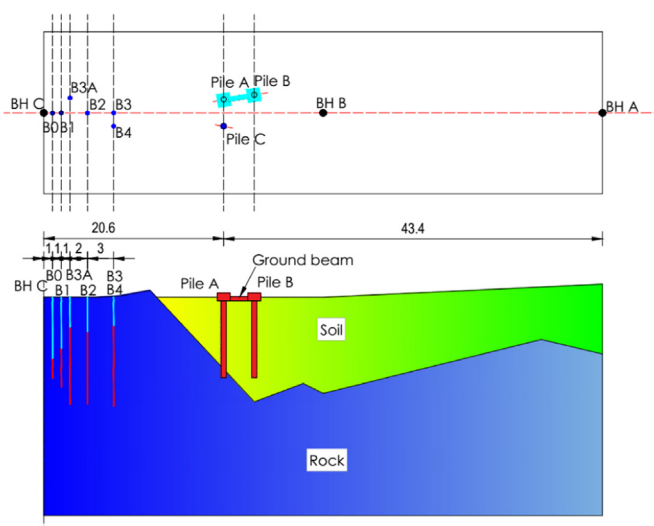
Plan and section view of the piles and blast holes locations (units of meters).
